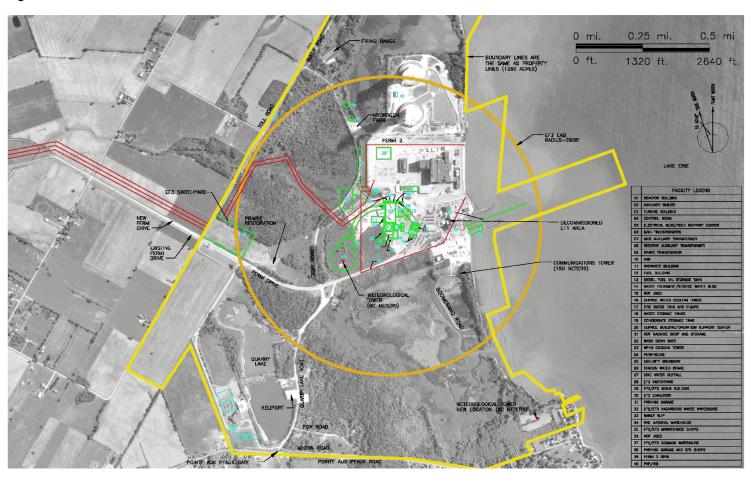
Fermi 3 Site Plan [EF3 COL 2.0-2-A]
